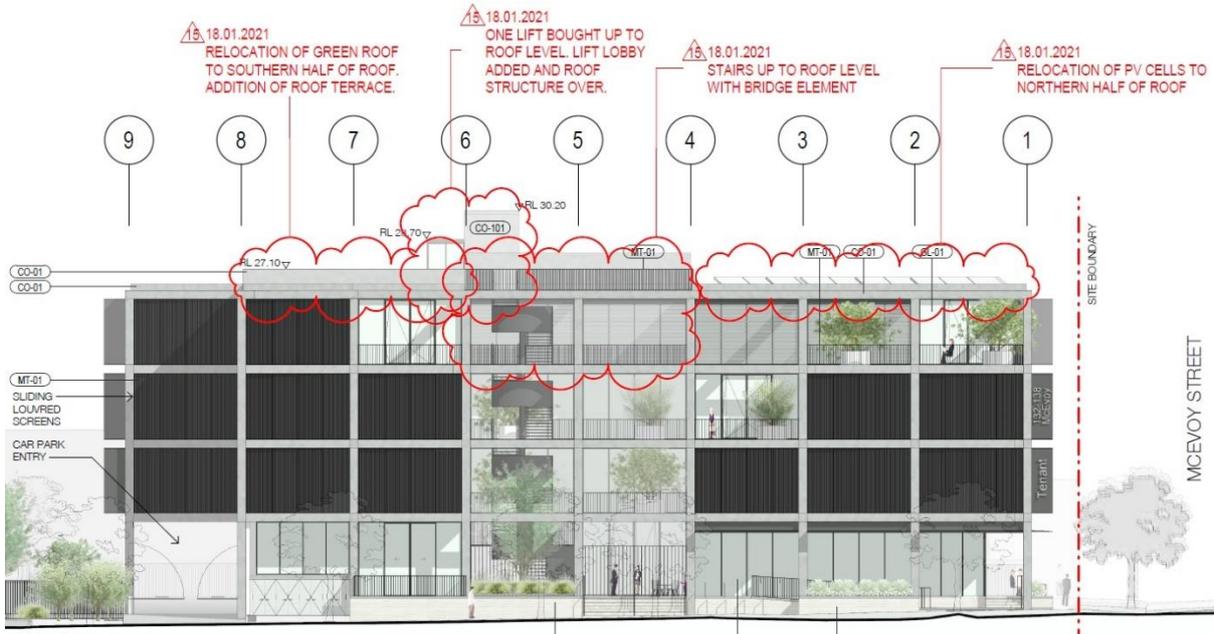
Proposed modifications to the Bowden Street (northeast) elevation
